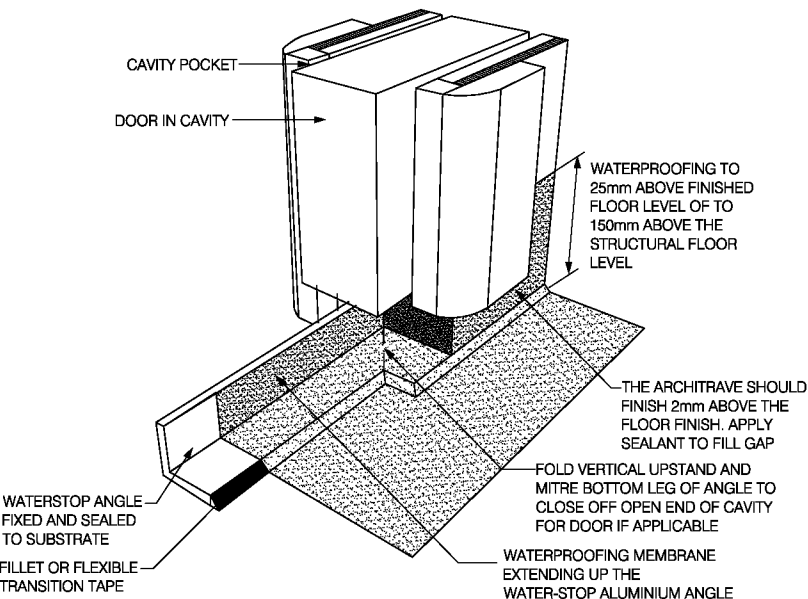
(B) WATERPROOFING AT DOOR OPENING
